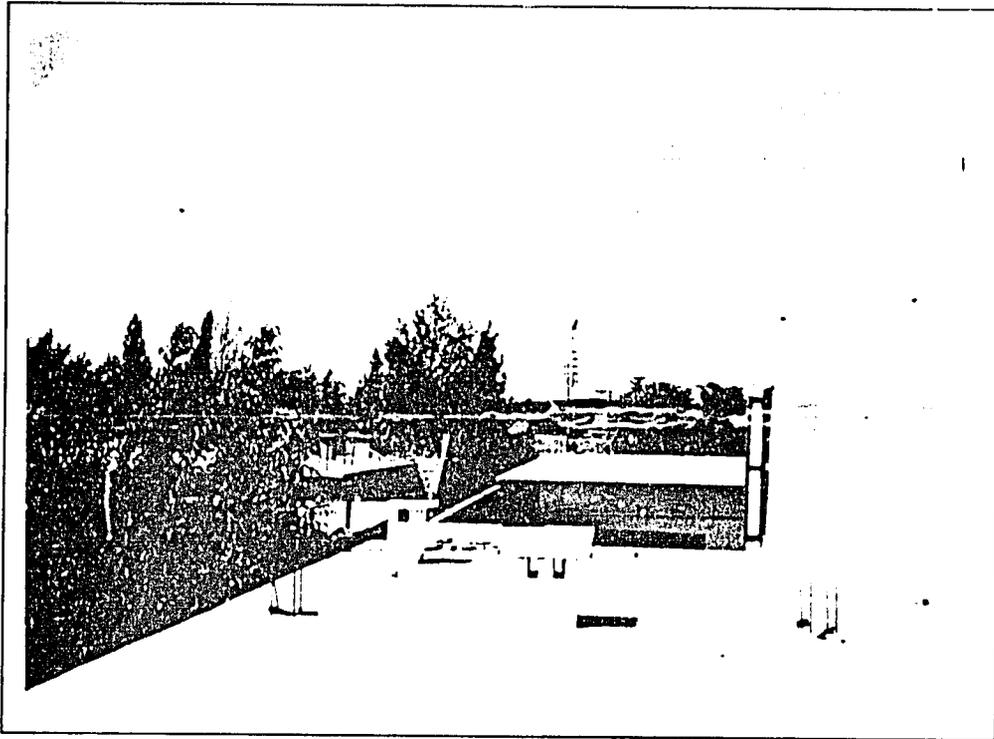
Quetta MSH Office Facility. Roof top view looking North Northwest.
